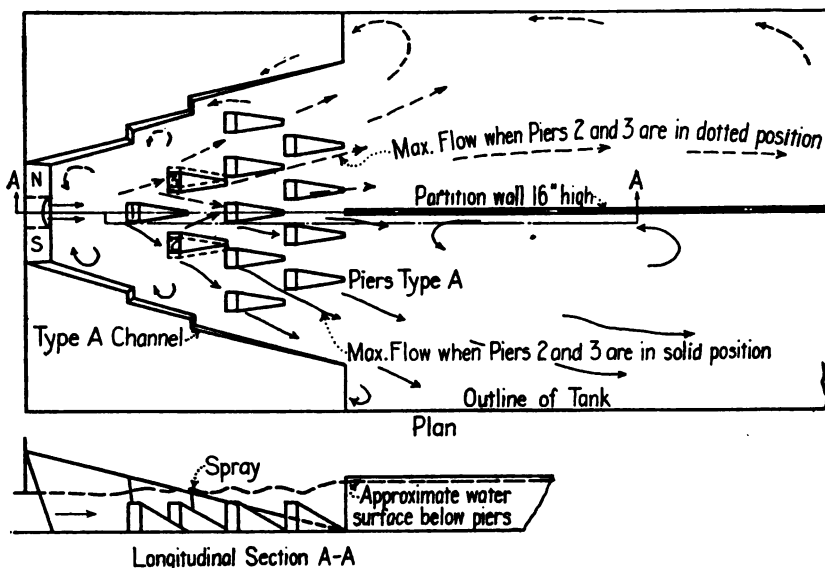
PLAN AND SECTION OF EXPERIMENTAL MODEL OUTLET CONTAINING BAFFLE PIERS.
